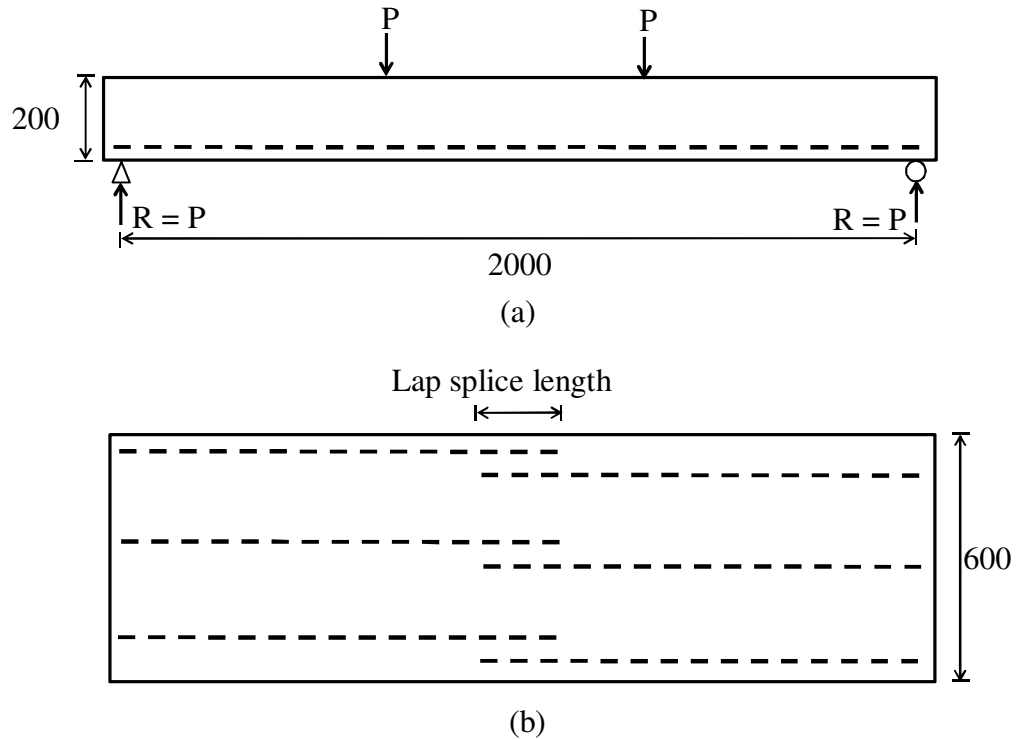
Full-scale reinforced concrete slab tests by Hamad & Monsour (1996): (a) elevation, and (b) plan (Hamad and Monsour, 1996).
